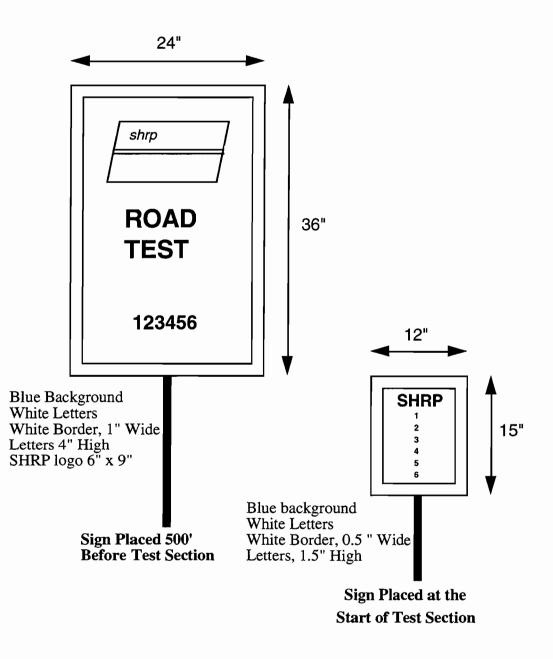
LTPP Test Section Sign Details (SHRP 88b)
